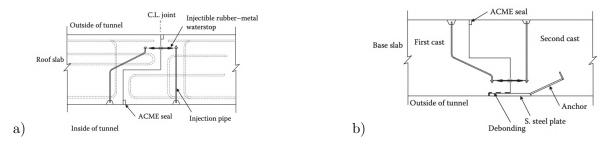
Typical expansion joint arrangement through a) tunnel roof and b) base slab (Lunniss and Baber, 2013)
